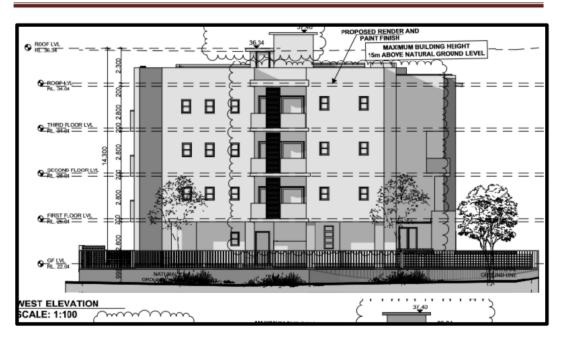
Extract of western rear elevation (Source: Archi build International P/L, 2019).
